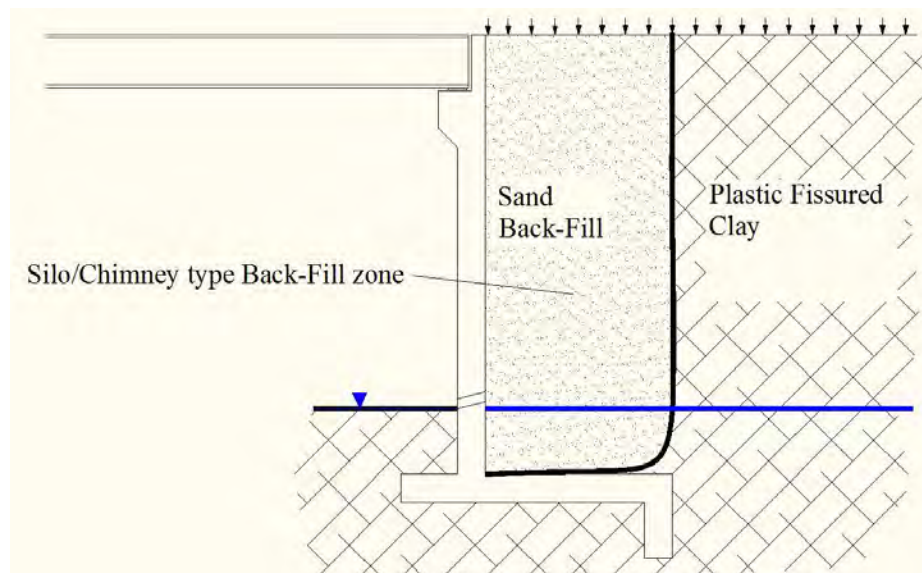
Lateral earth pressure; Silo/Chimney back-fill condition.
